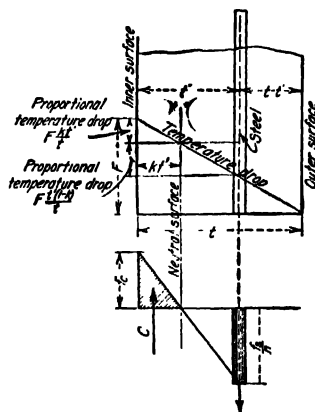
Temperature stresses in a vertical section of a concrete chimney shaft.
